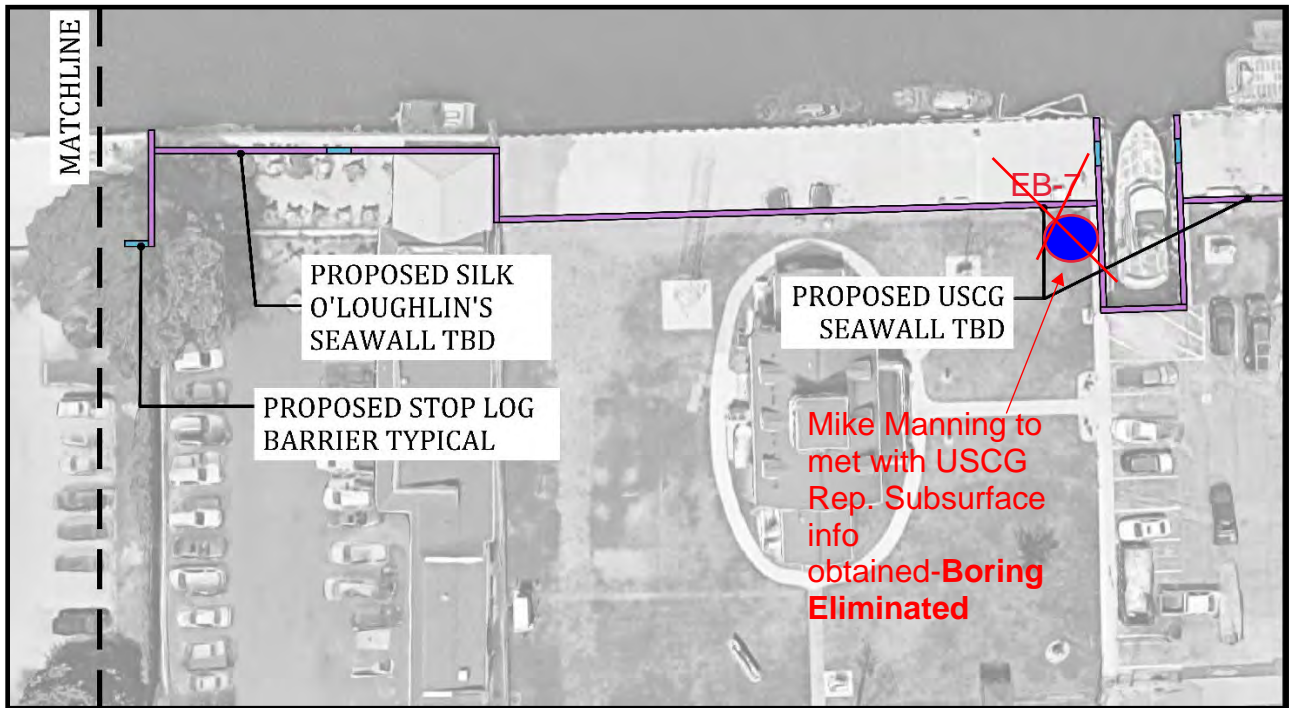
Seawall Concept Plan C: Silk O'Loughlin's and USCG Station
